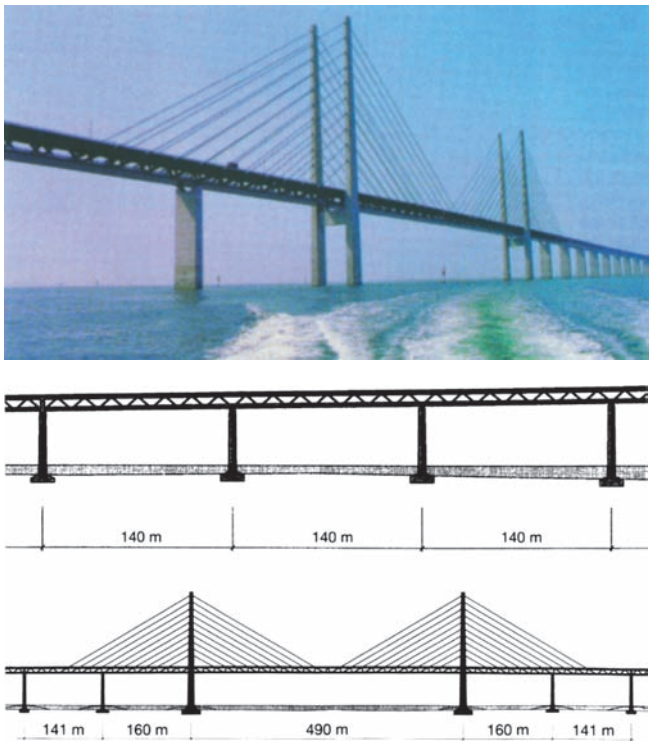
Main cable-stayed bridge on the Øresund.
